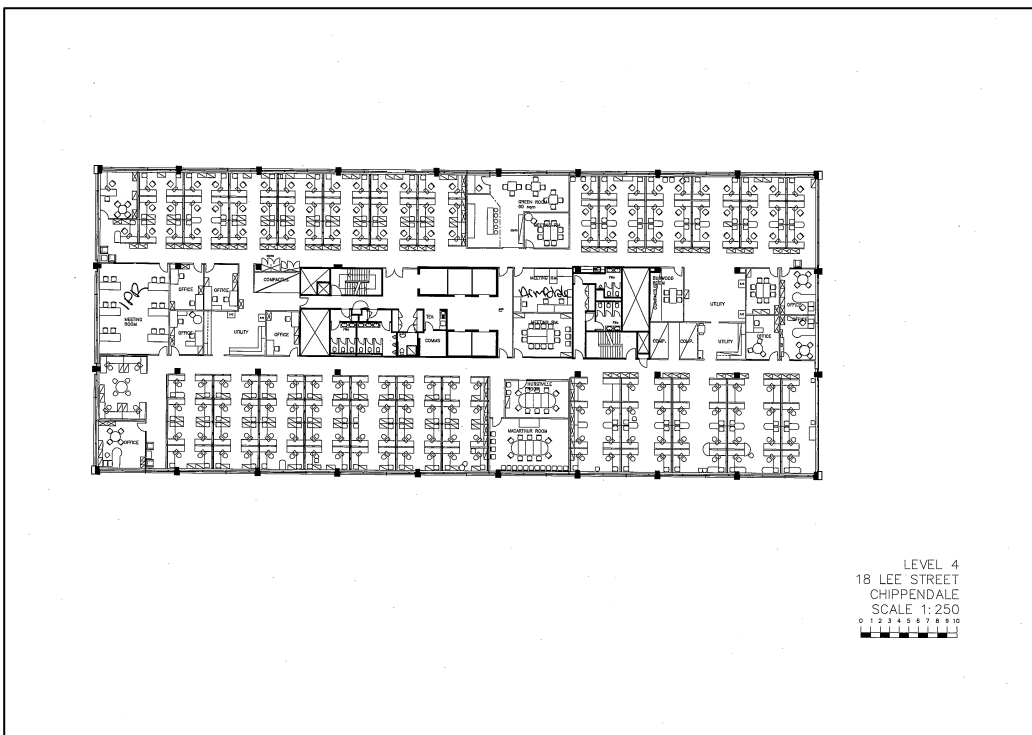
Existing Building – Typical Floor Plan as approved (Level 4)
